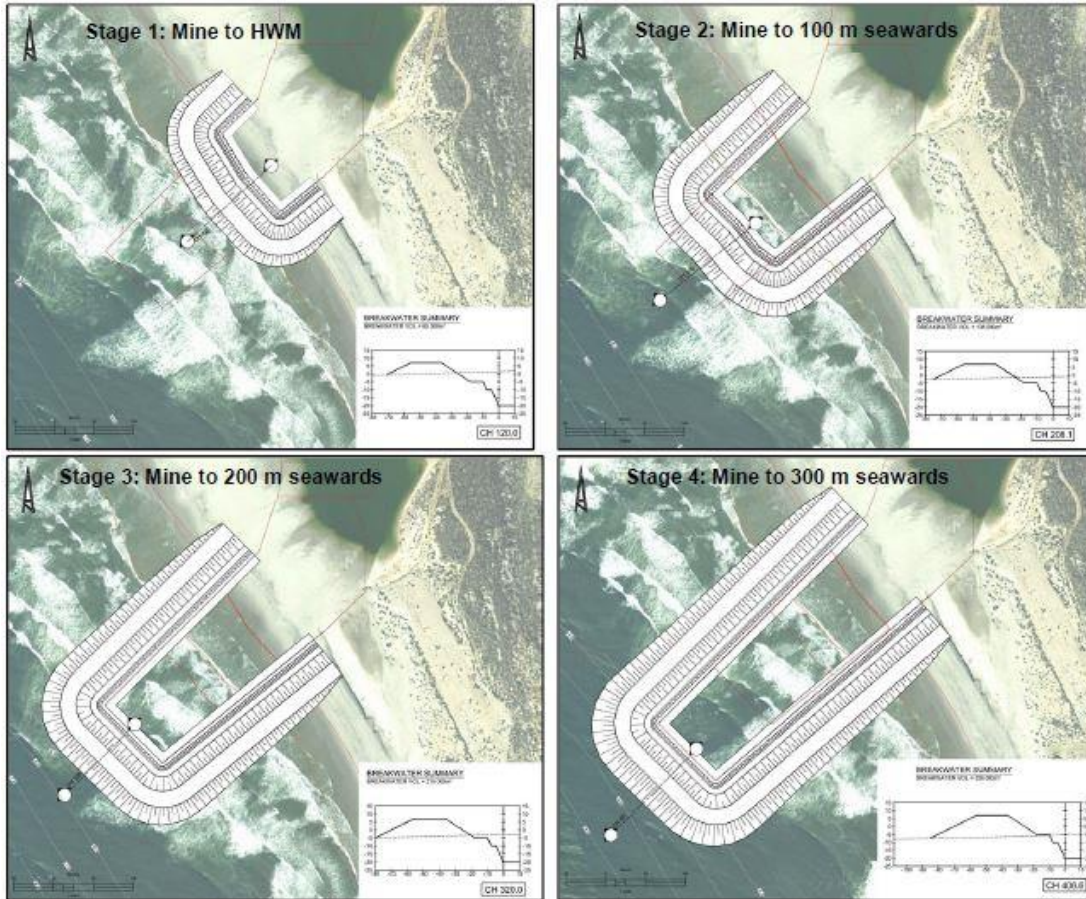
Proposed phased rock berm construction at Koingnaas 68/69, Somnaas and Langklip Central (Source: WSP 2015).
